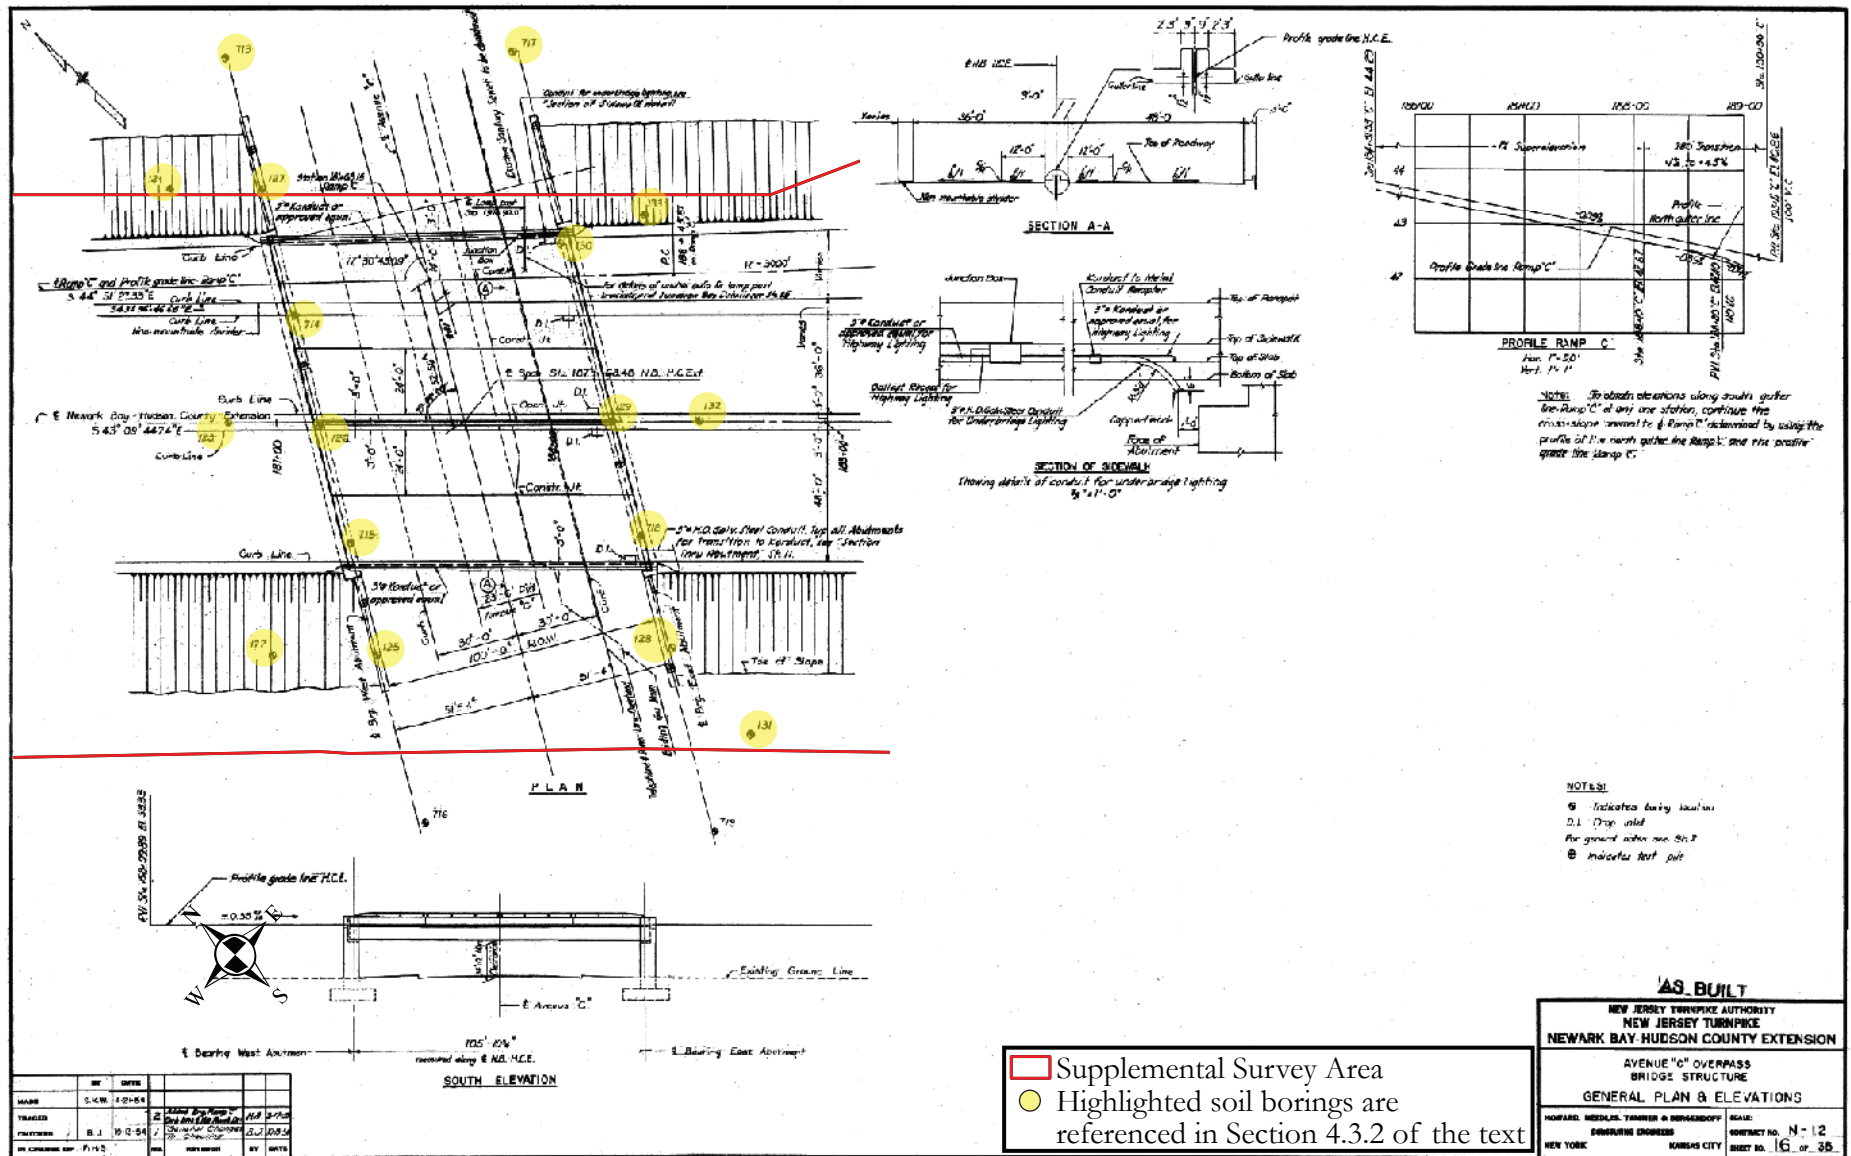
Avenue C Overpass Bridge Structures, General Plan and Elevation, showing soil boring locations (Howard, Needles, Tammen and Bergendoff 1954b).
